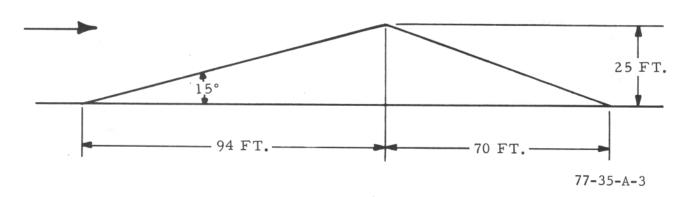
CONSTRUCTION DETAILS OF A 15° SLOPE
